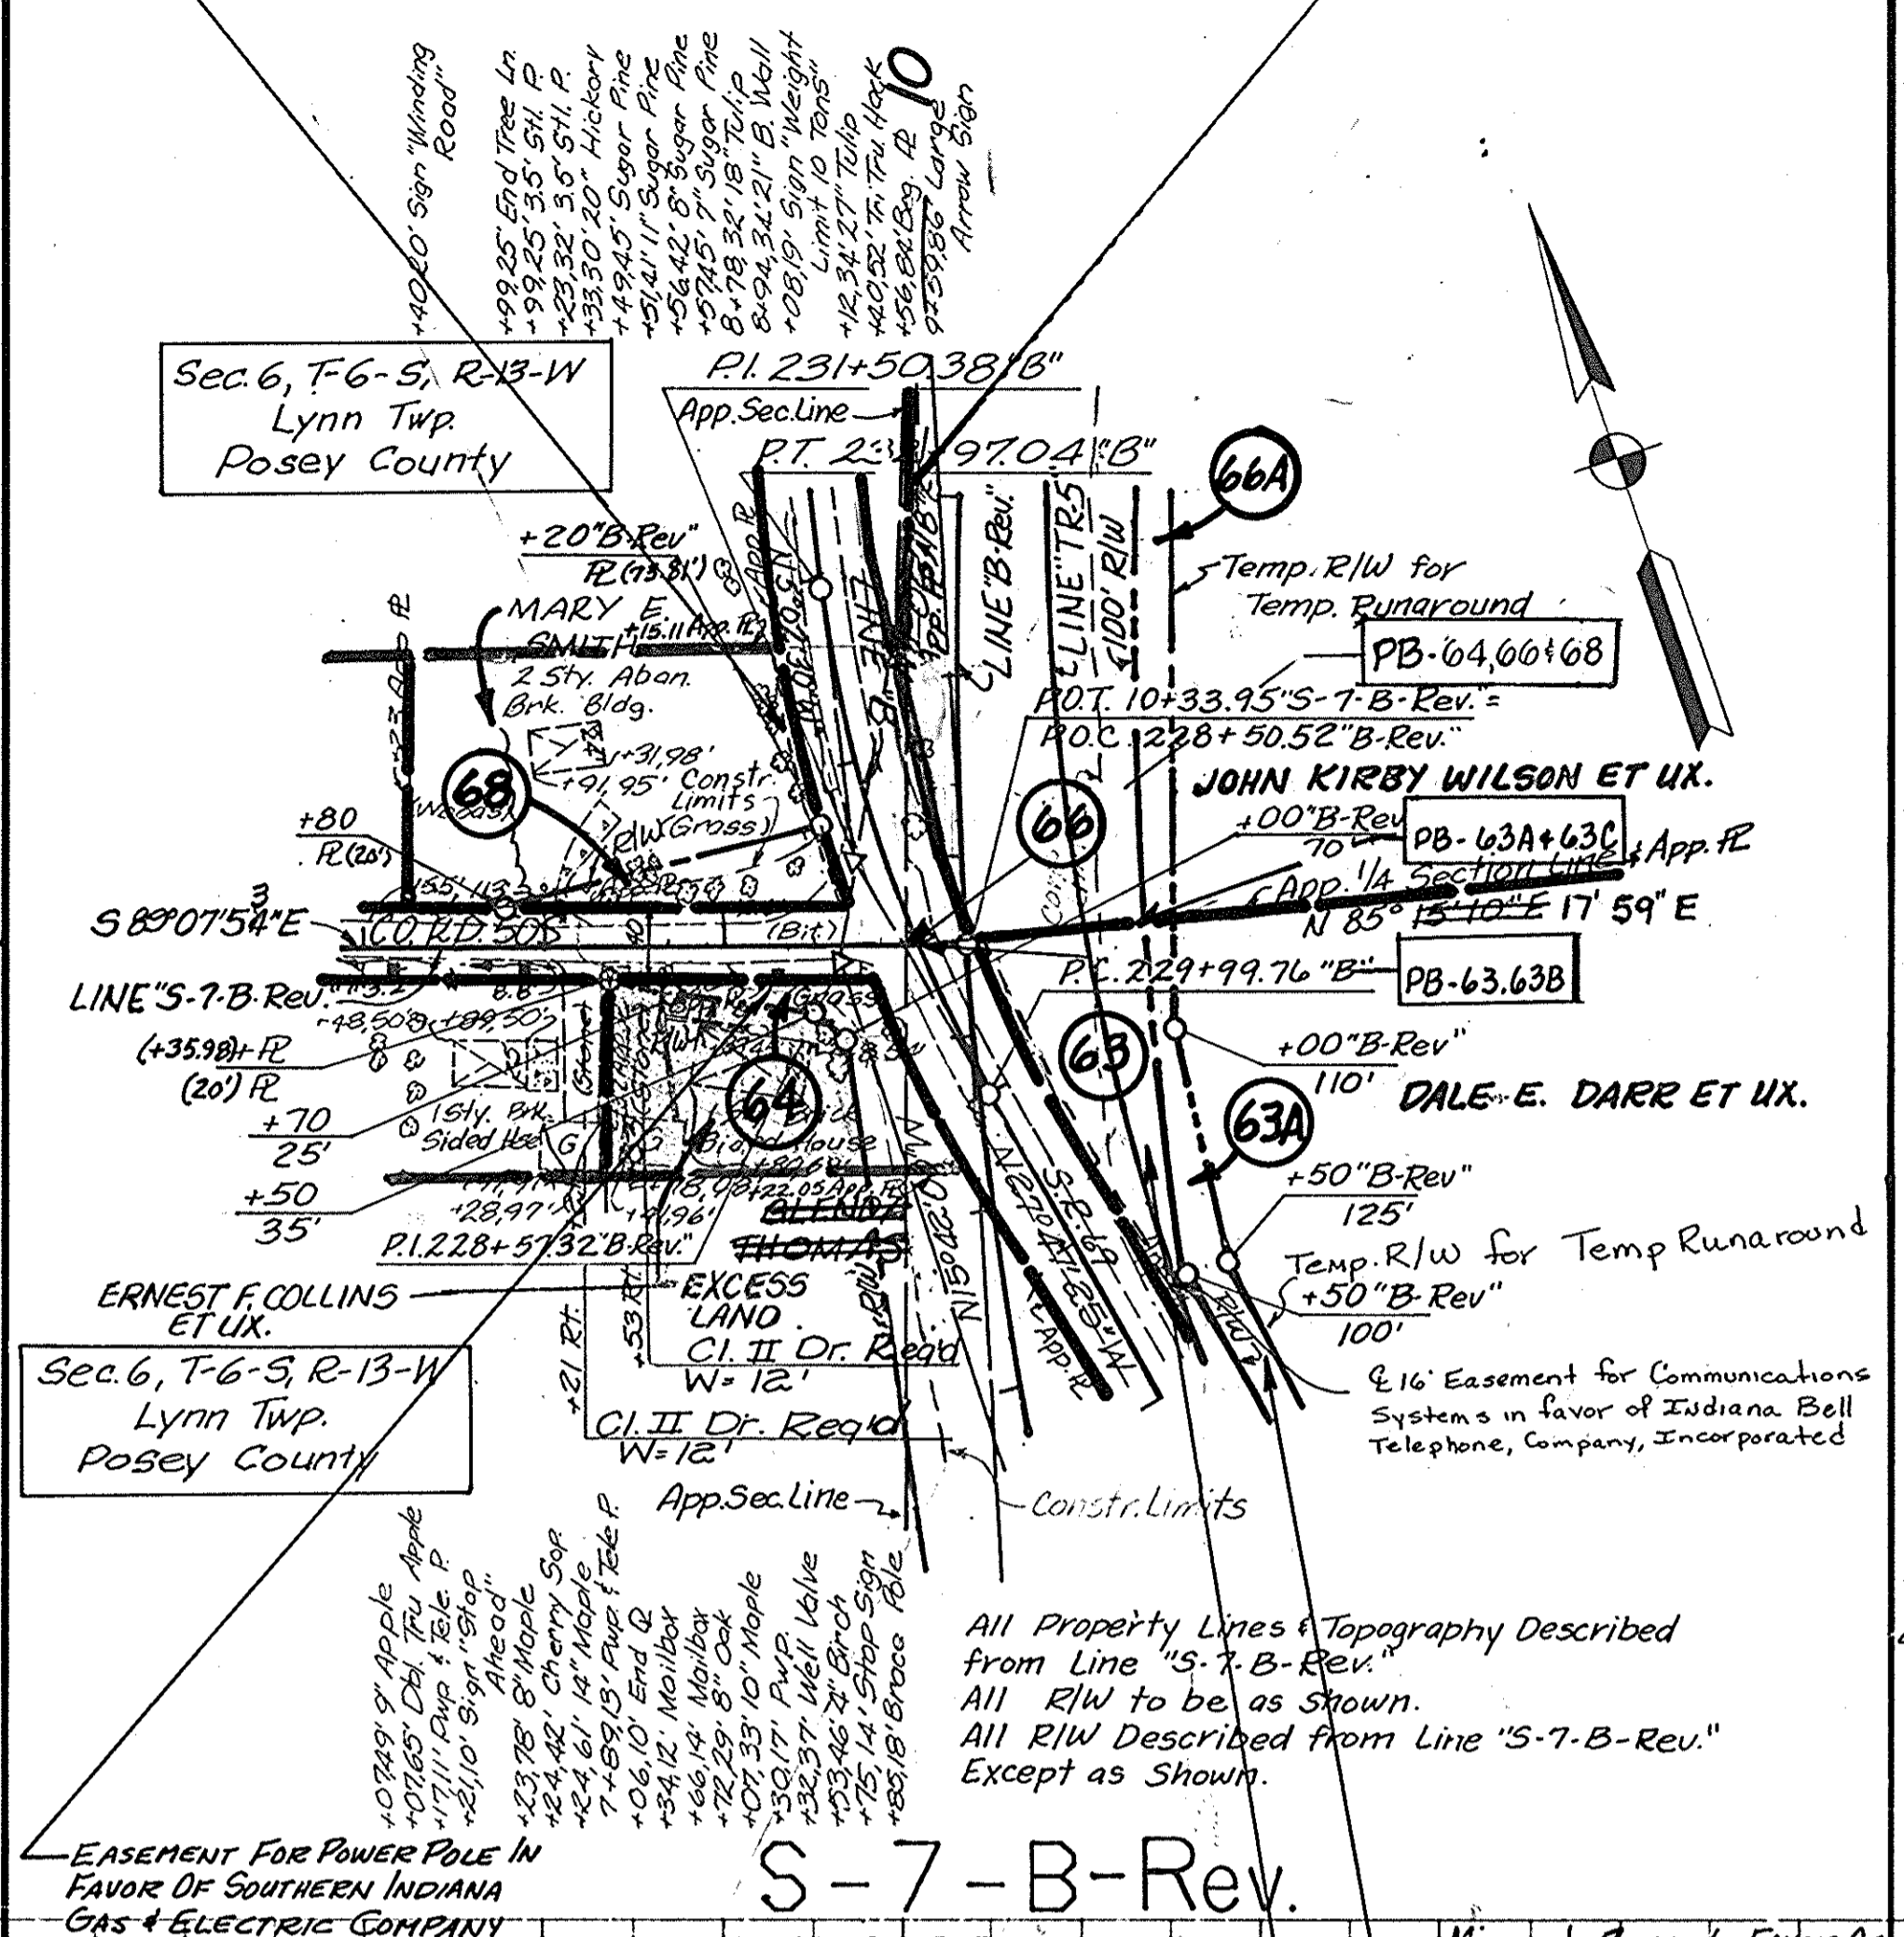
PLAN - PROFILE D. A. R. STANDARD 1975
